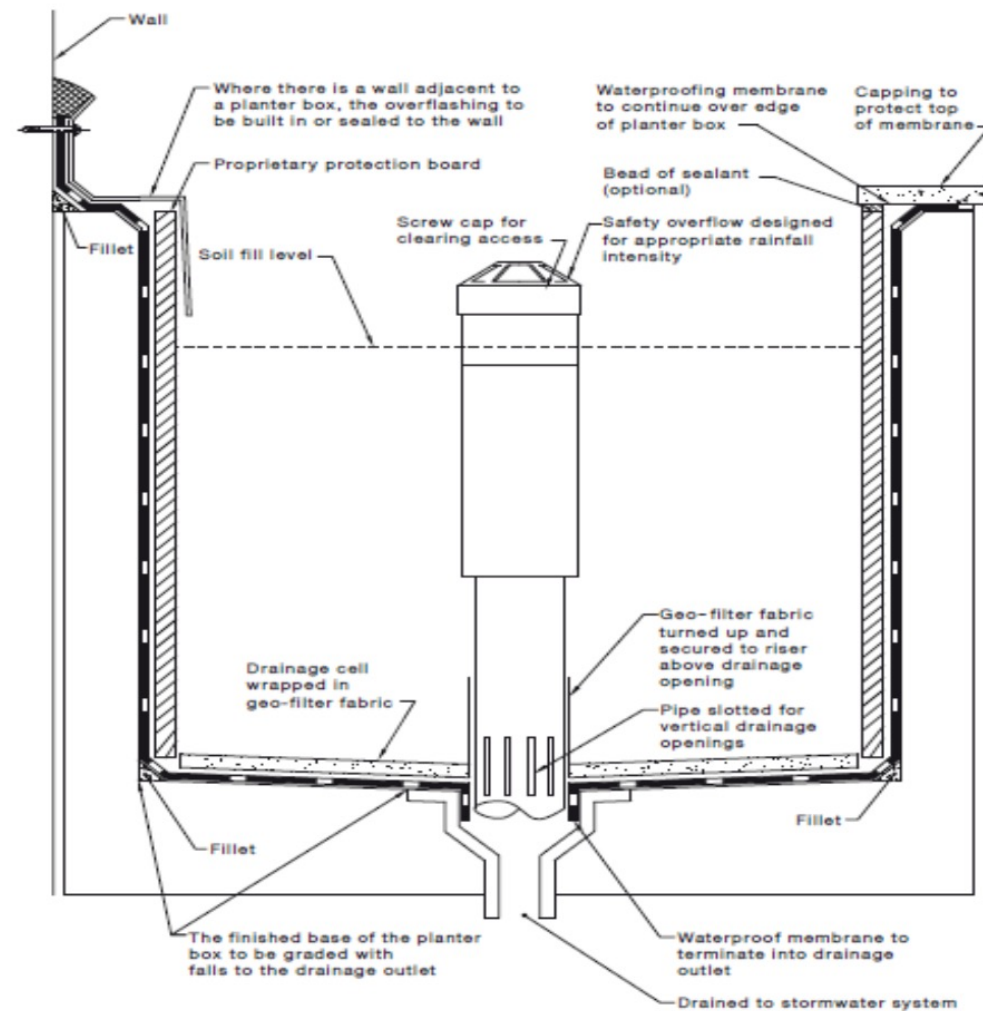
TYPICAL PLANTER BOX CONSTRUCTION
